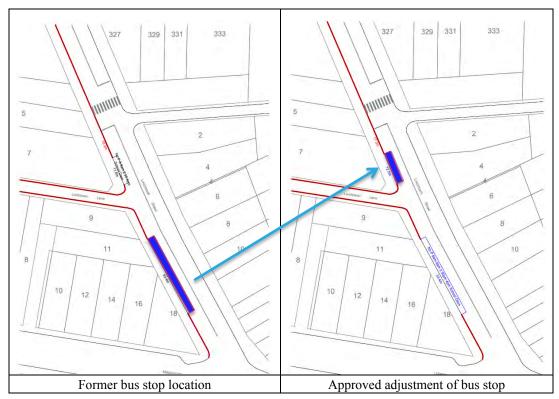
Approved trial adjustment to Bus Zone in Leichhardt Street
